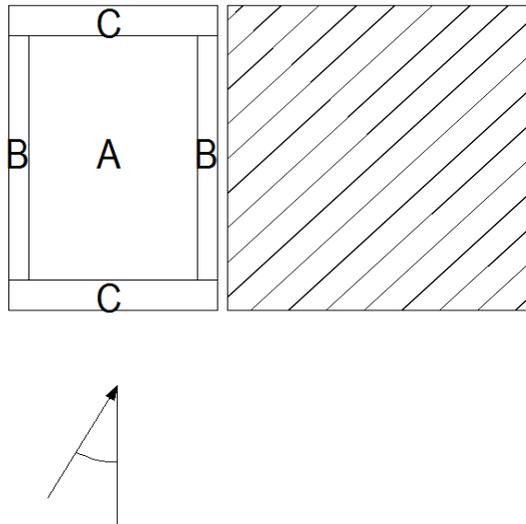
Wind longitudinal on the Ground Floor Canopy
